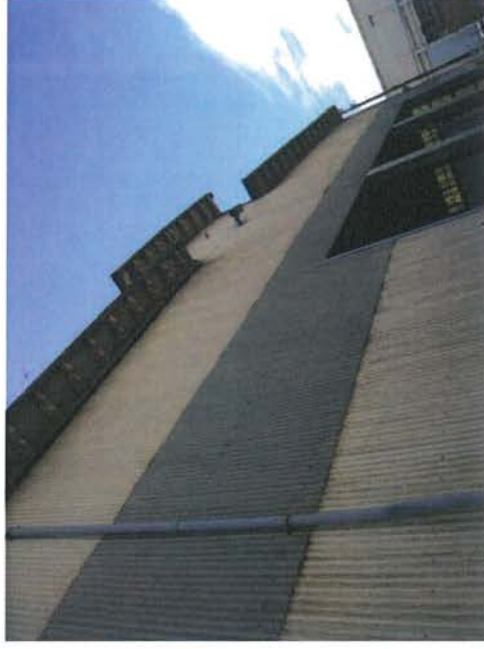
Auto Truck Garage & Repair Shop (7) end elevation
